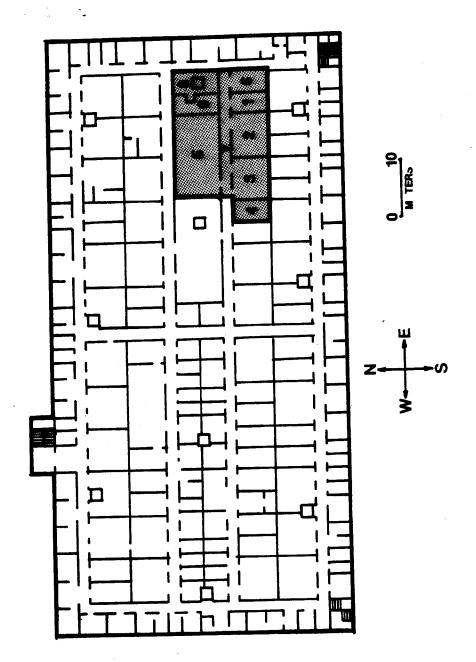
Building 004 Second Floor Plan Indicating Location of Hot Chemistry Area (1-9).
